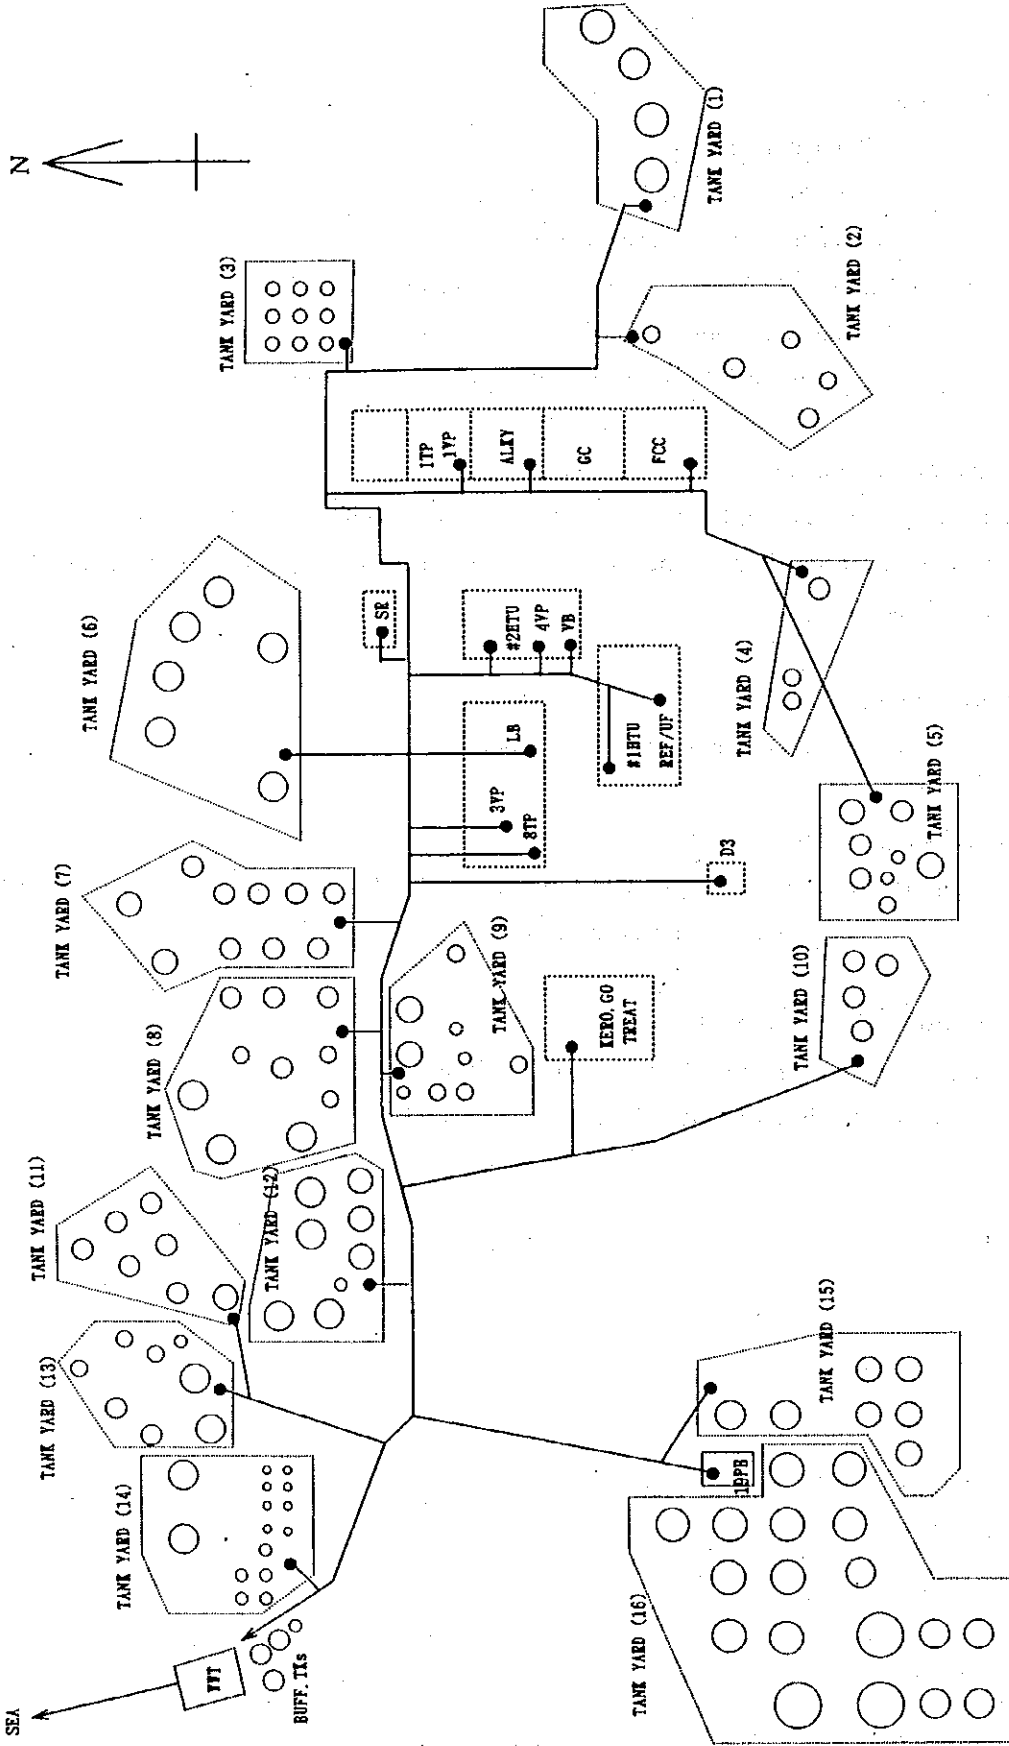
Location of New Waste Water Treatment Facilities, Pointe-a-Pierre Refinery
